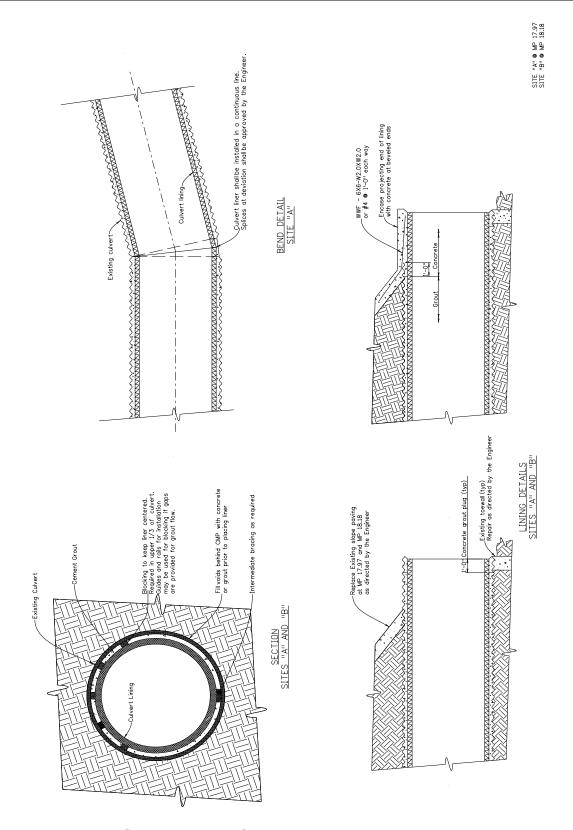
(L)-2 Sample Details for Repairing a circular culvert by slip-lining
